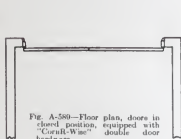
Floor plan, doors in closed position, equipped with "CornR-Wise" double door hardware.
